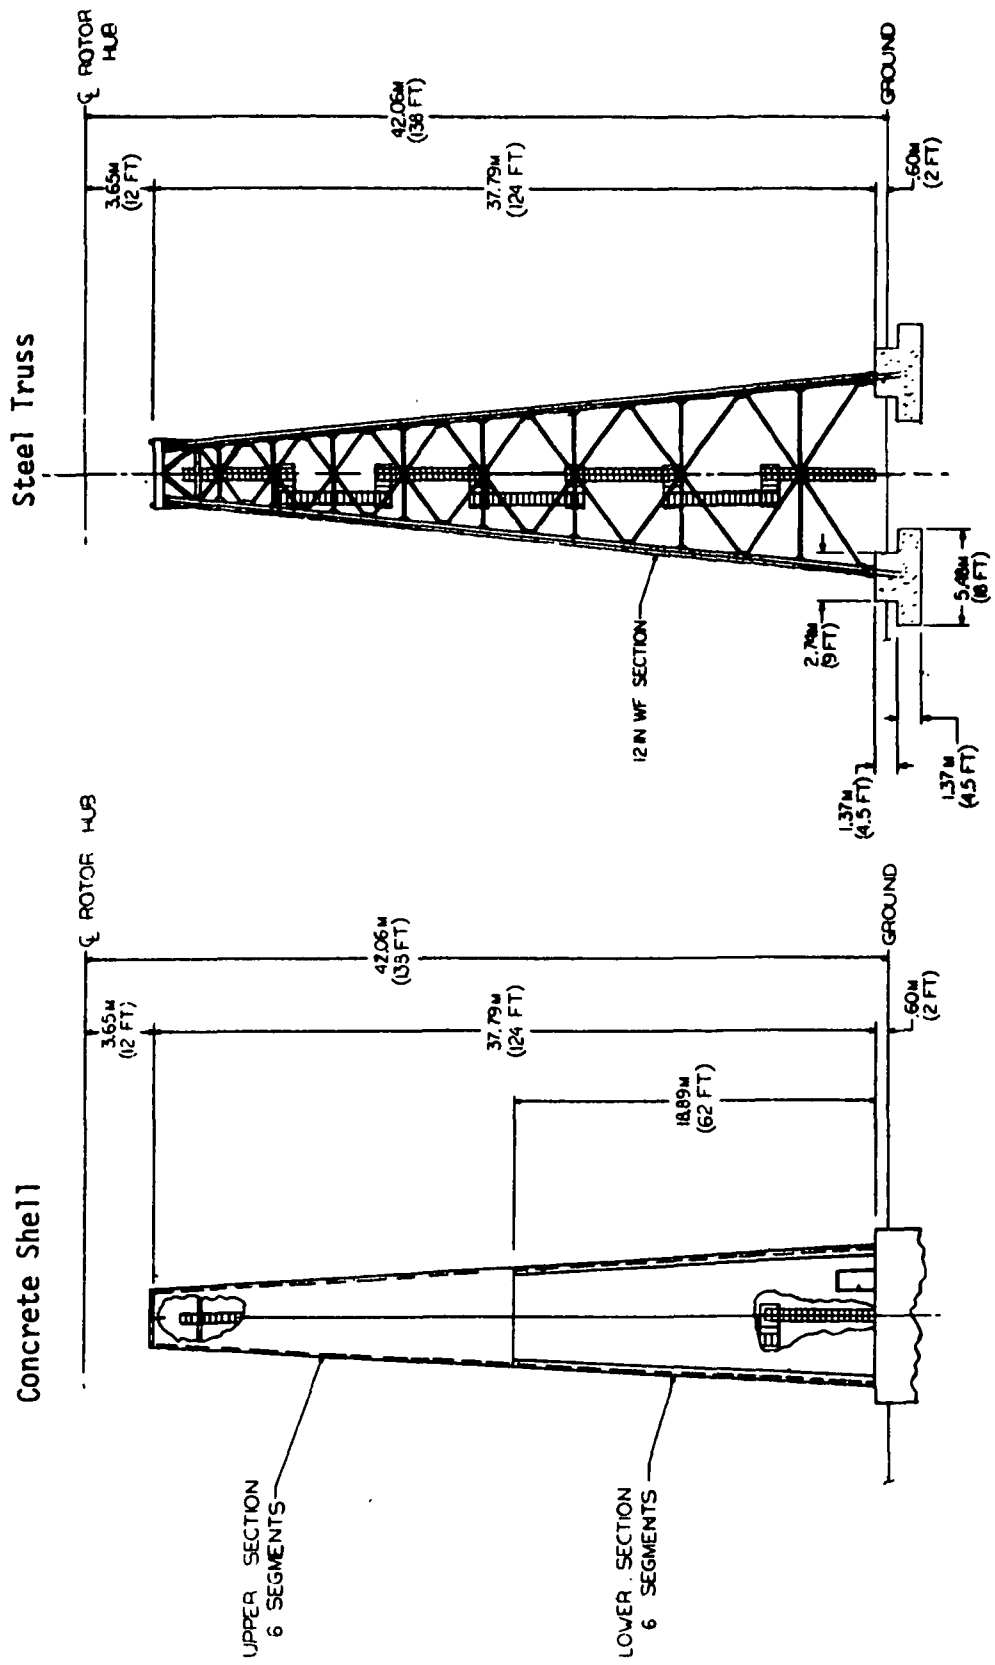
1500 kW WGS Concrete Shell and Steel Truss Towers
